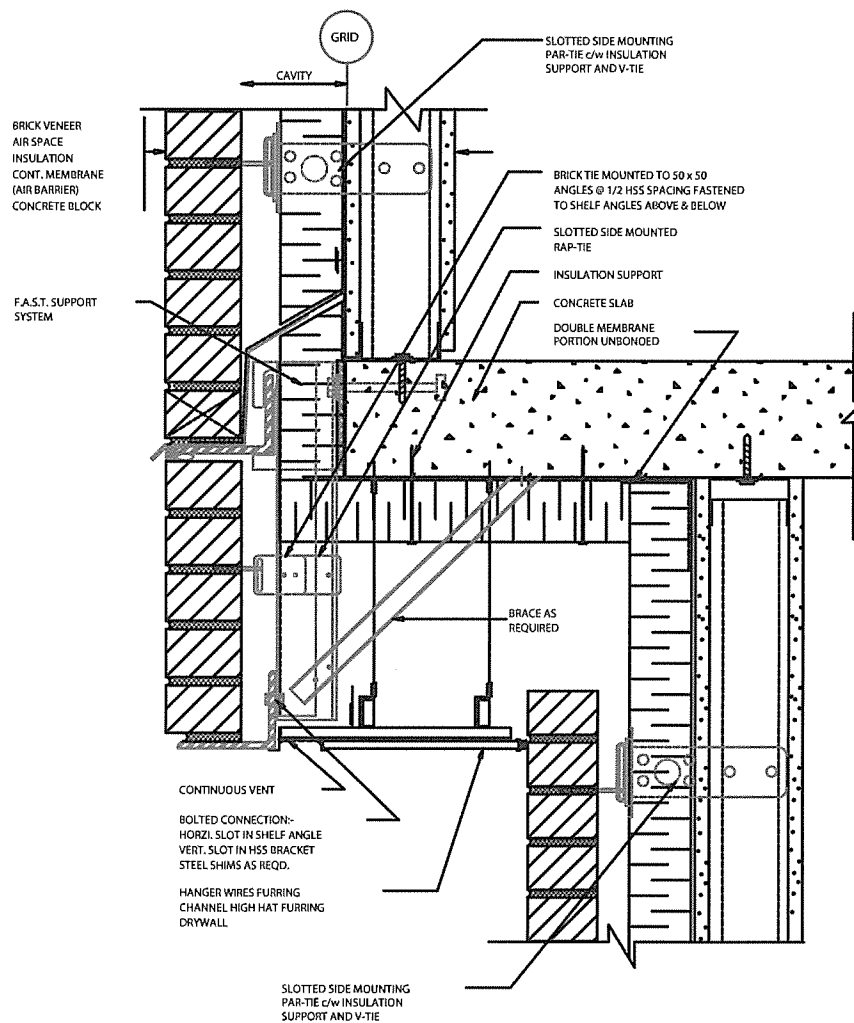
BRICK VENEER/STEEL STUD-COLD SOFFIT DETAIL
